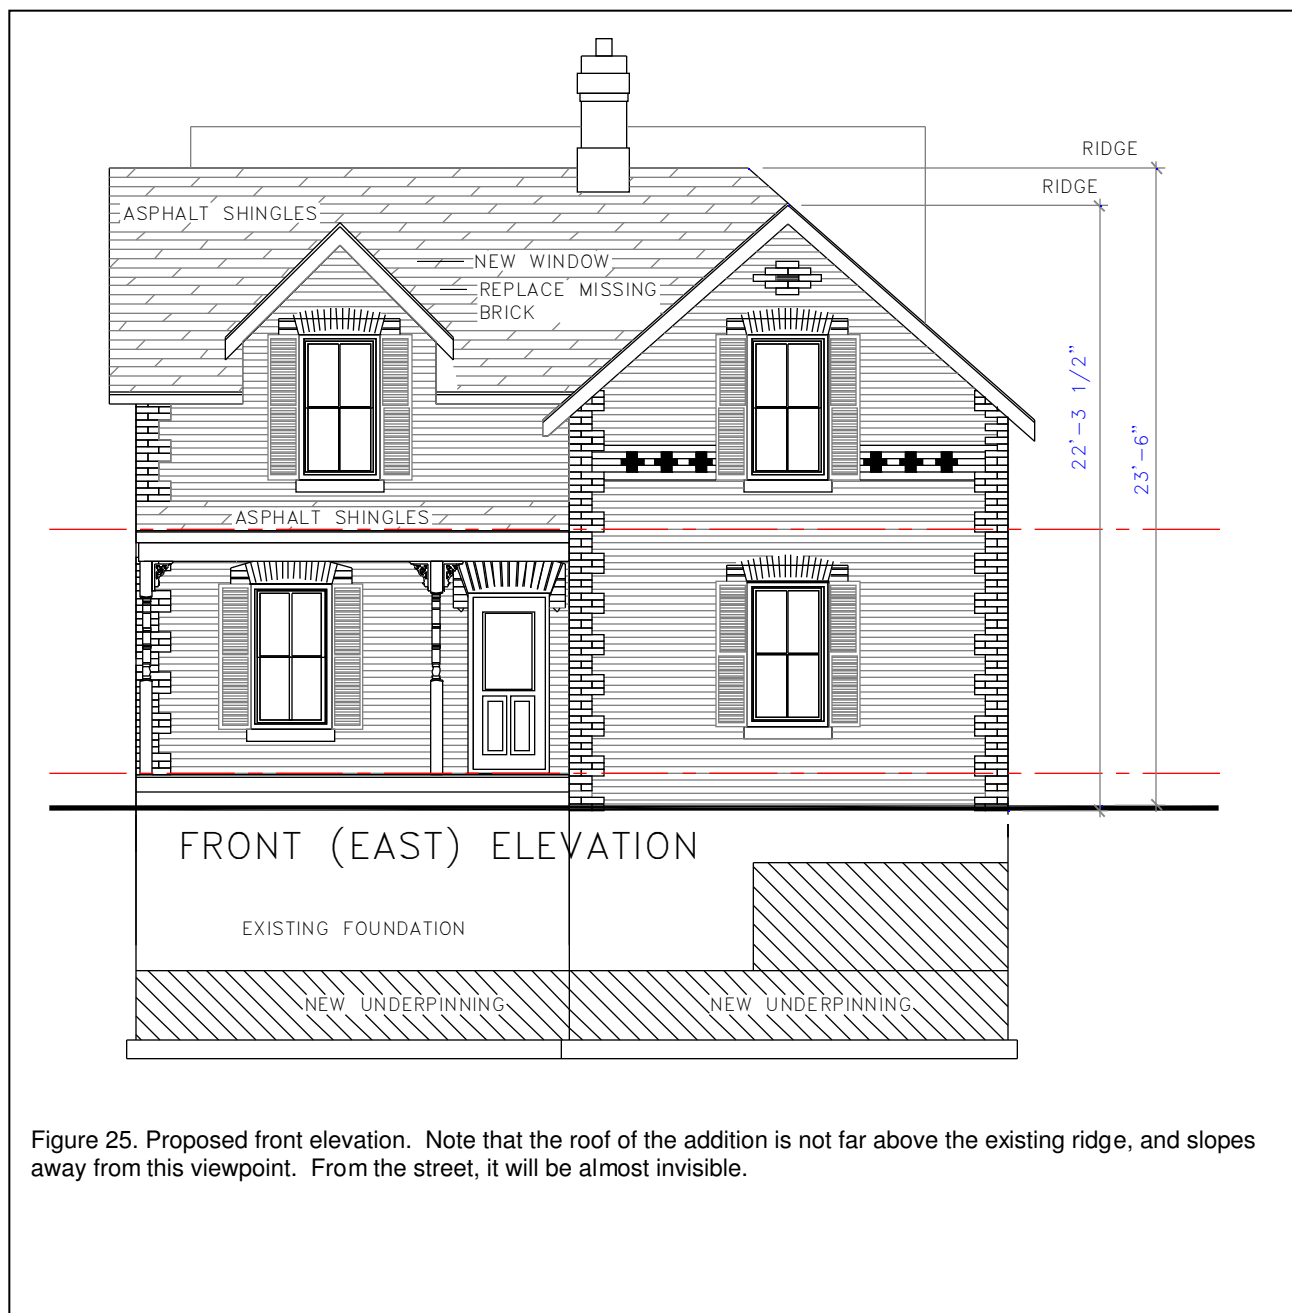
Proposed front elevation. Note that the roof of the addition is not far above the existing ridge, and slopes away from this viewpoint. From the street, it will be almost invisible.
